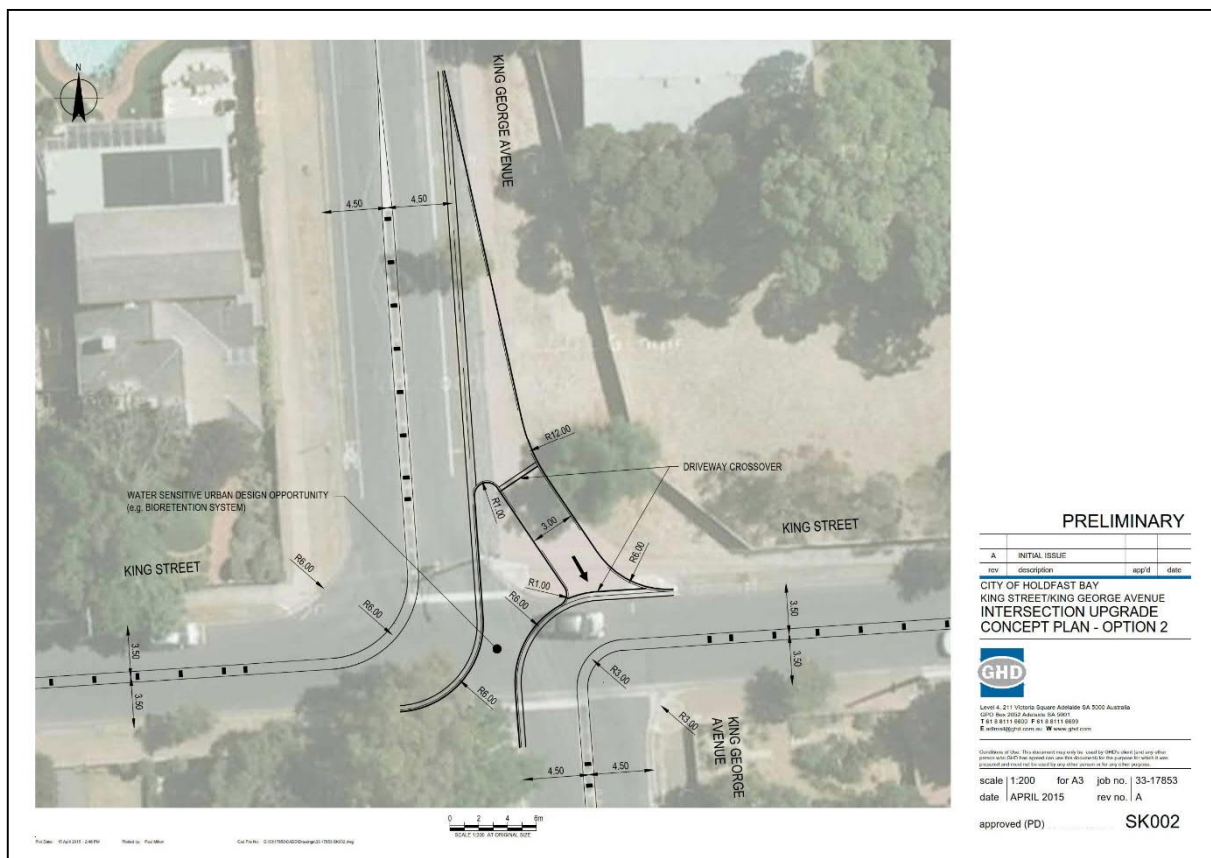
Intersection of King George Ave & King St – upgrade concept plan option 2
